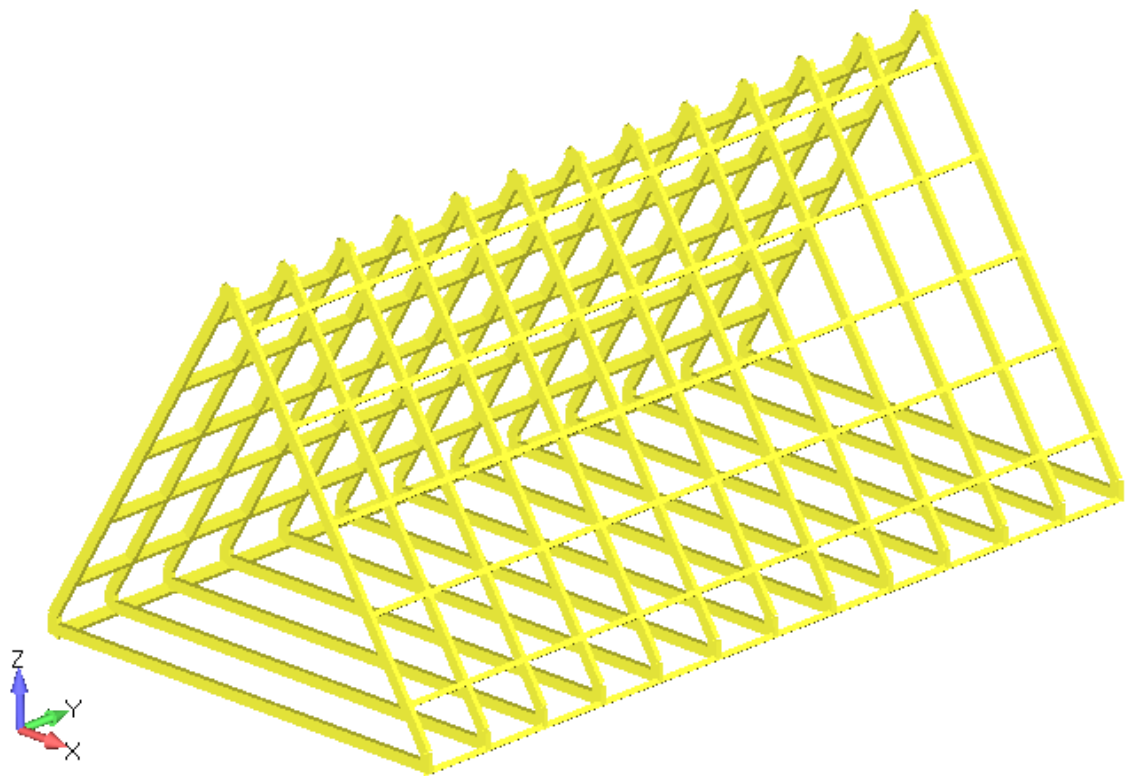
General view of the FINHA-A 100 building frame, 4.3 meters wide
